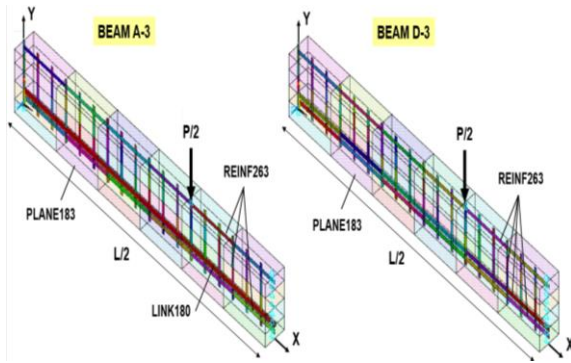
Comparison between the discretization adopted for the reinforcing bars, stirrups, and prestressing cables for the beams tested by Gongchen and Xuekang (1988)
